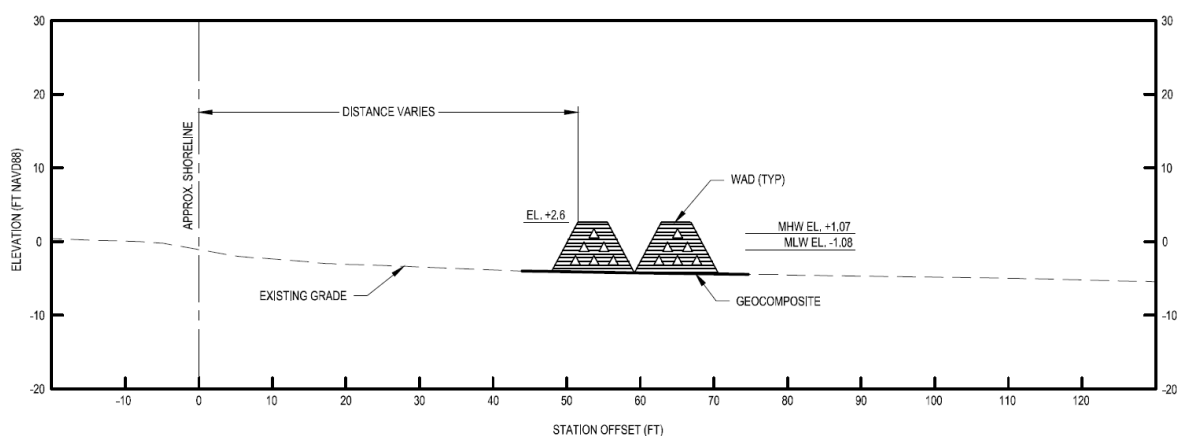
Typical Section of a Wave Attenuation Structure at Alignment B
